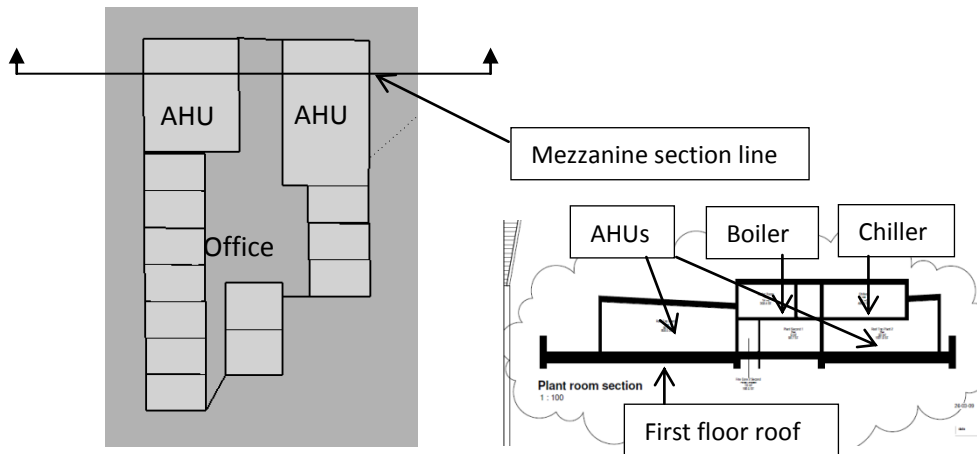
Second floor and roof plan / Section of the mechanical space using a mezzanine⁵⁹
